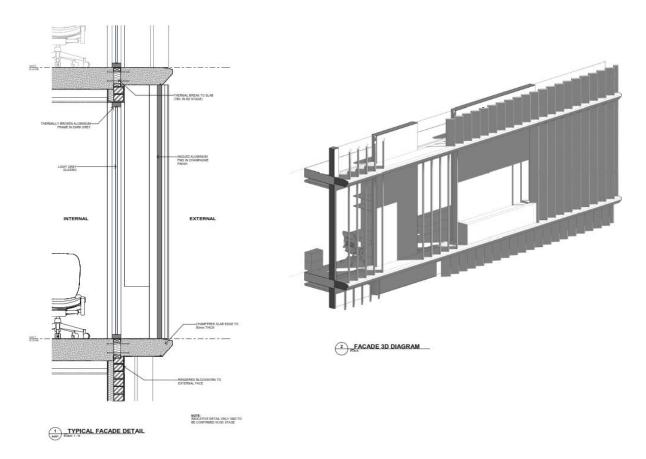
Typical Façade Detail and 3D diagram for privacy fins set at 45 degrees
